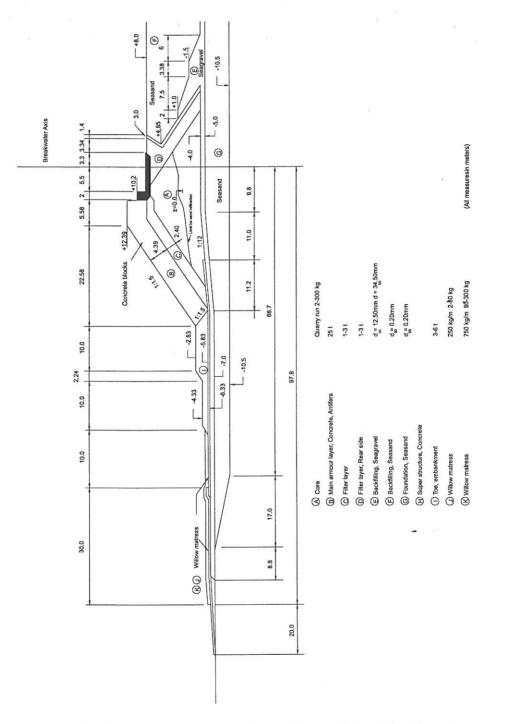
Design layout, cross-section of the Zeebrugge breakwater.
